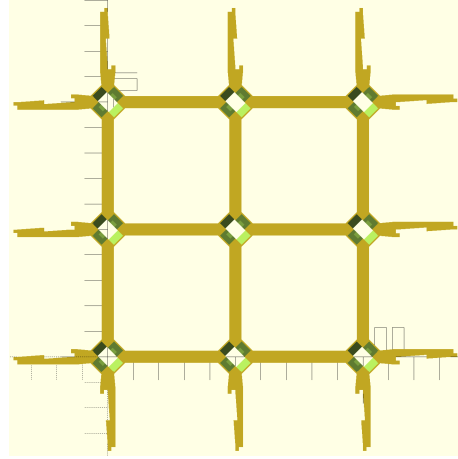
Upper/bottom grid module for space frame with optional joints in four directions
